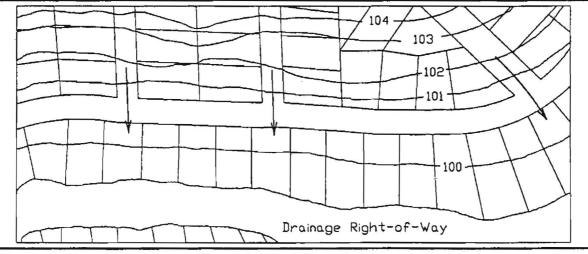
Undesirable Overland Flow at Street Intersections
